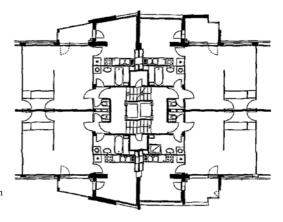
Typical Floor Plan after Renovation 改修後の平面図
